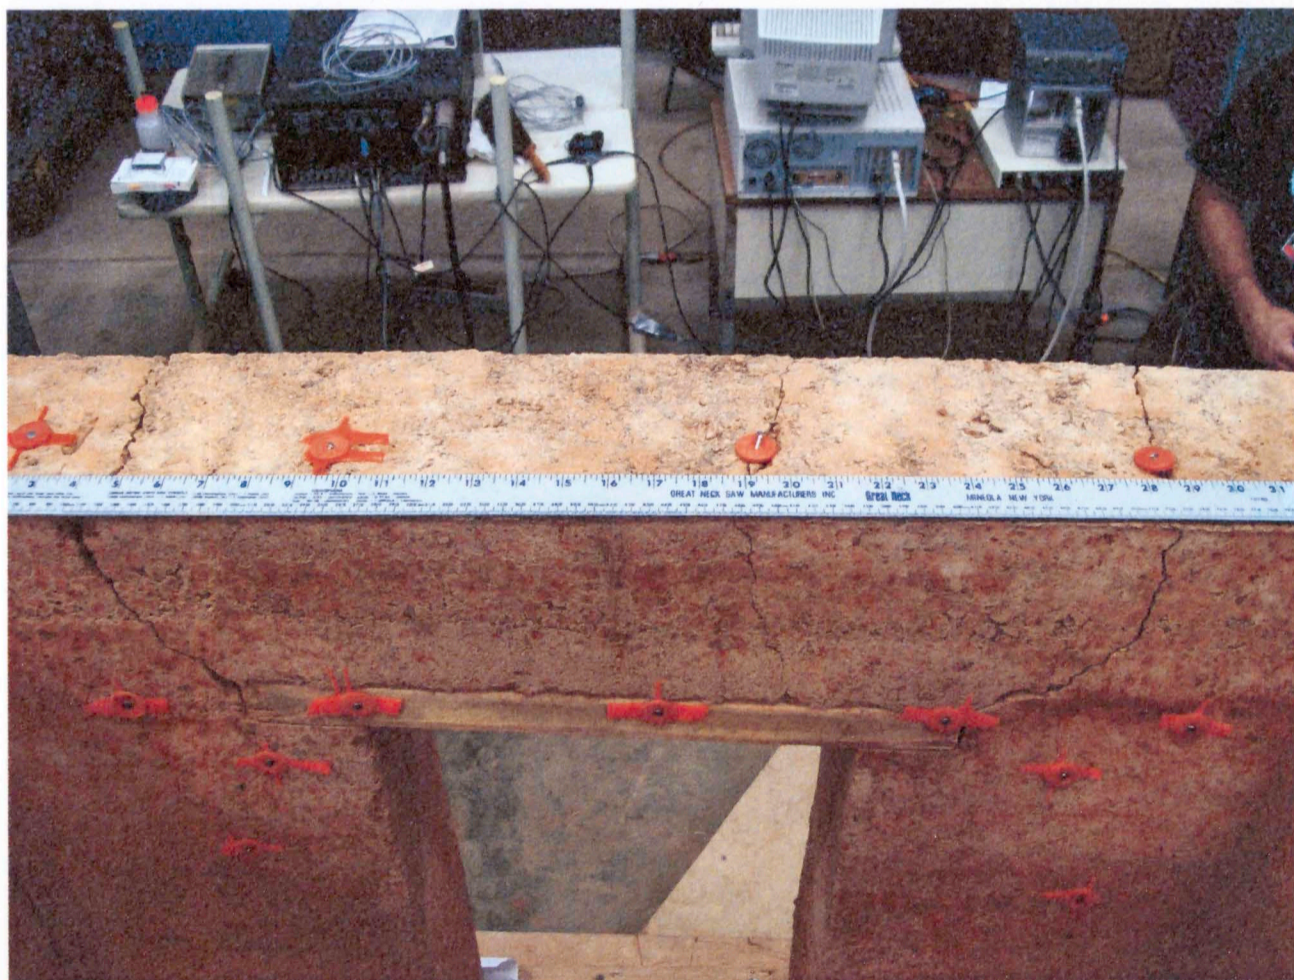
Test 4 view of cracks with nails above lintel in east wall after test
